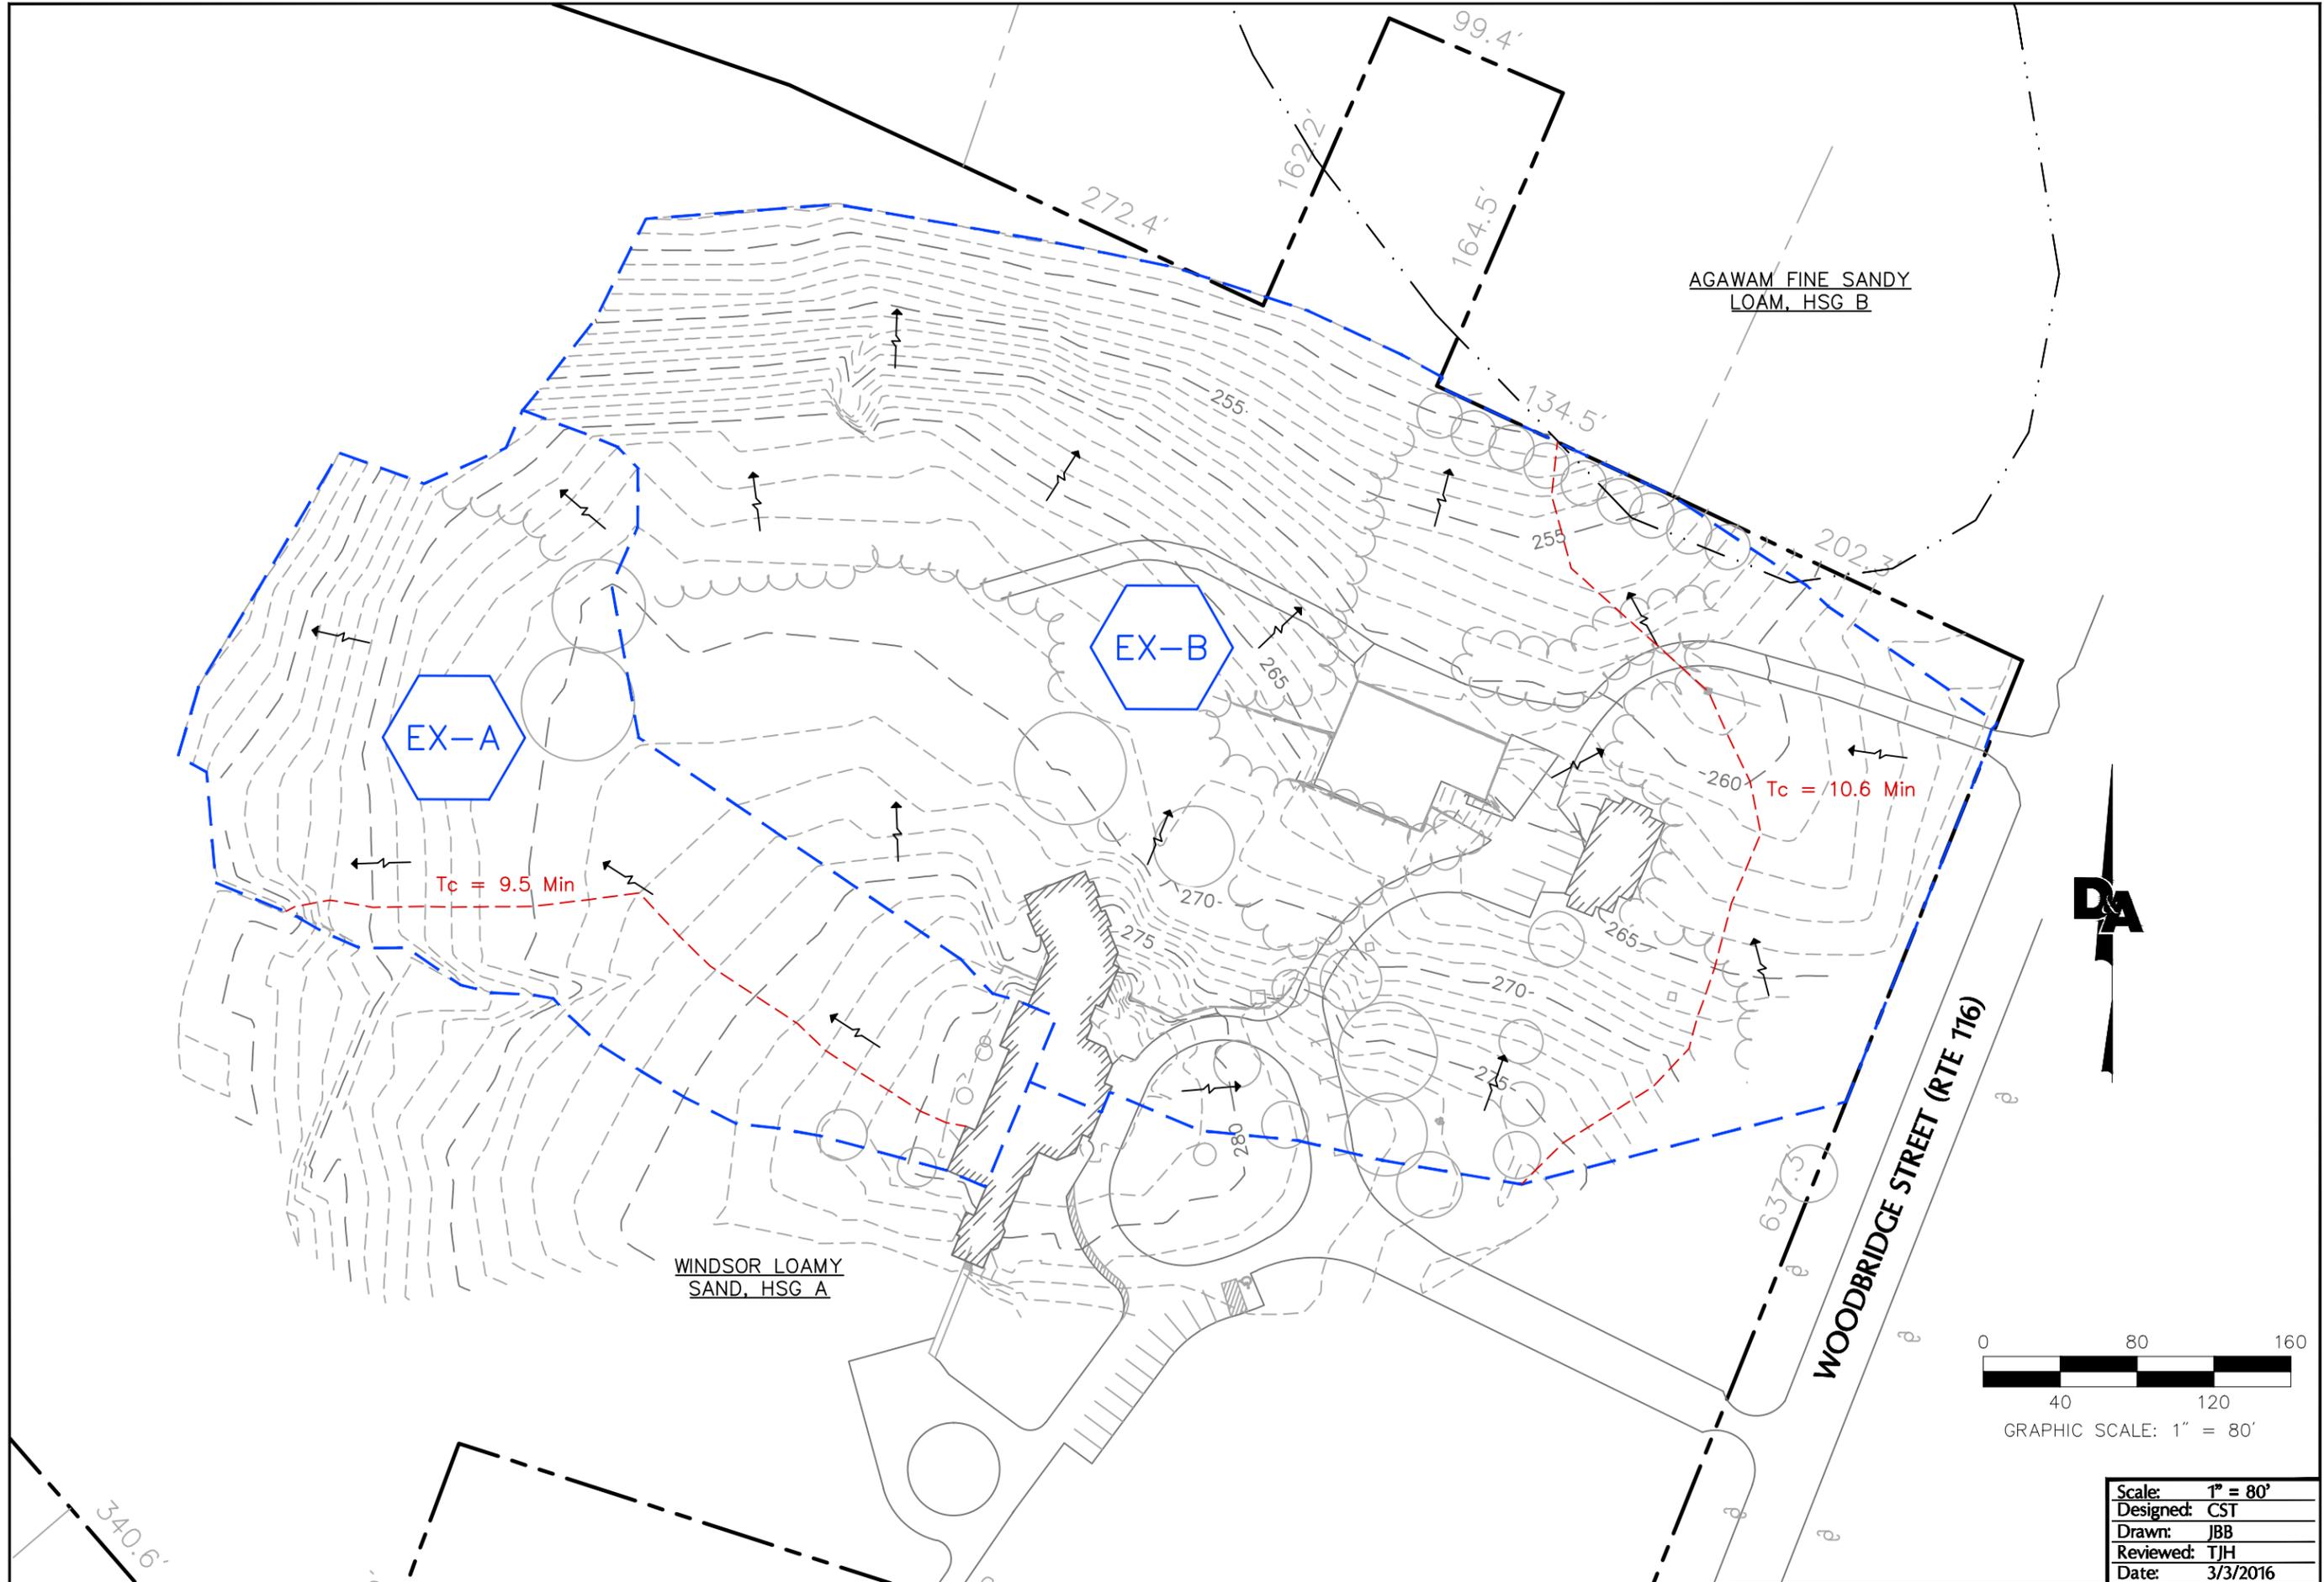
EXHIBIT A: EXISTING CONDITIONS DRAINAGE AREAS
